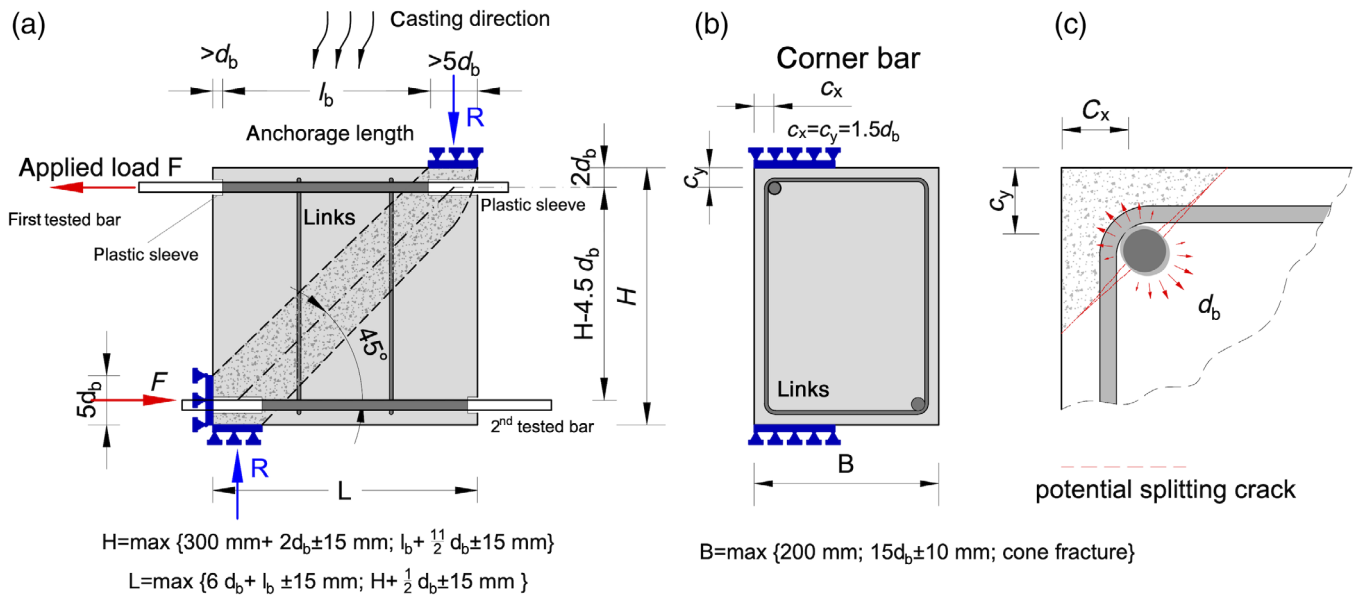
Beam end test specimen: longitudinal view (a); cross section and detailing of the concrete cover (b); splitting cracks at corner specimen (c).
